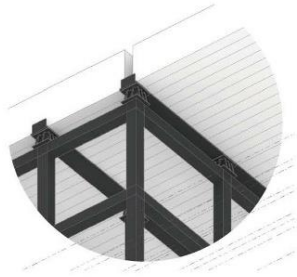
Construction joint between wood and steel structure (Edited the source-Kengo Kuma's official website)
